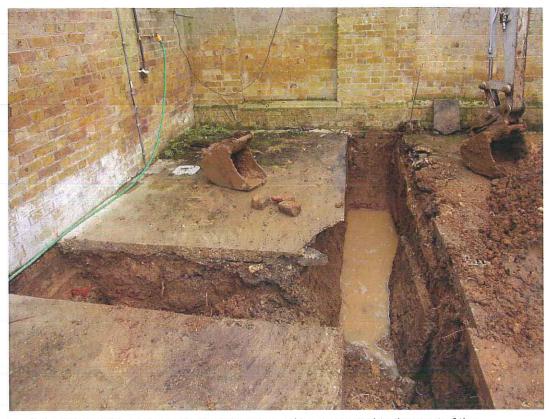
Looking south, showing the foundation trenches excavated to the west of the annexe building (and north of the stables block)
